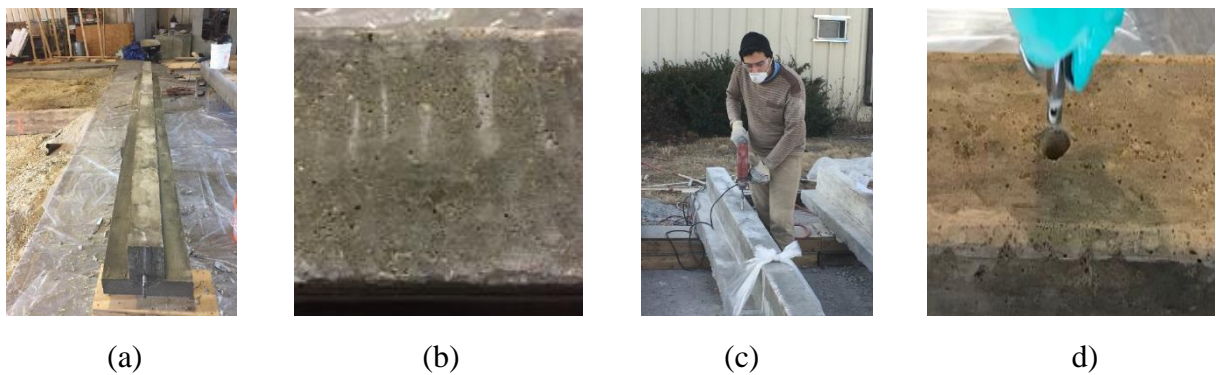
Surface preparation (a) before the preparation; (b) after rounding and roughening the surface; (c) drilling the hole; and (d) cleaning the holes
